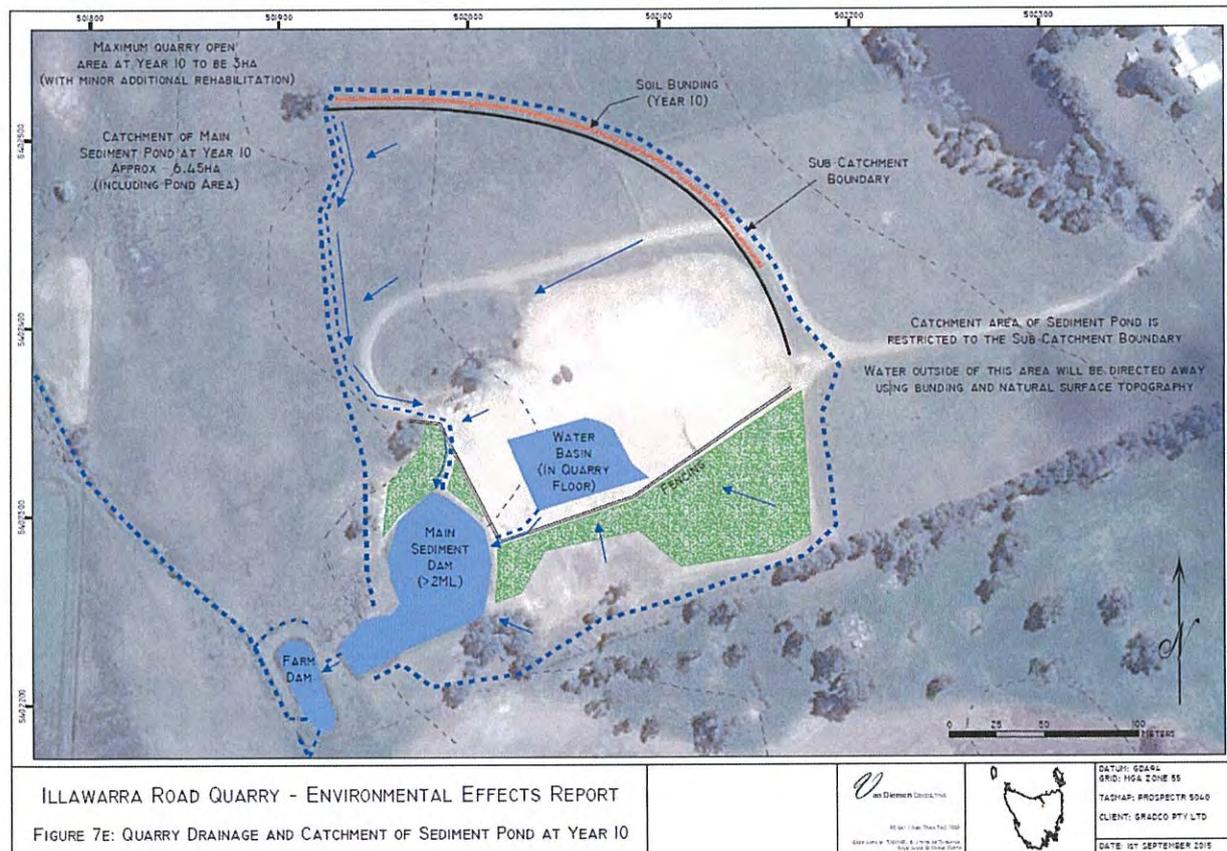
Stormwater Management System layout (Figure 7E of the EER).
